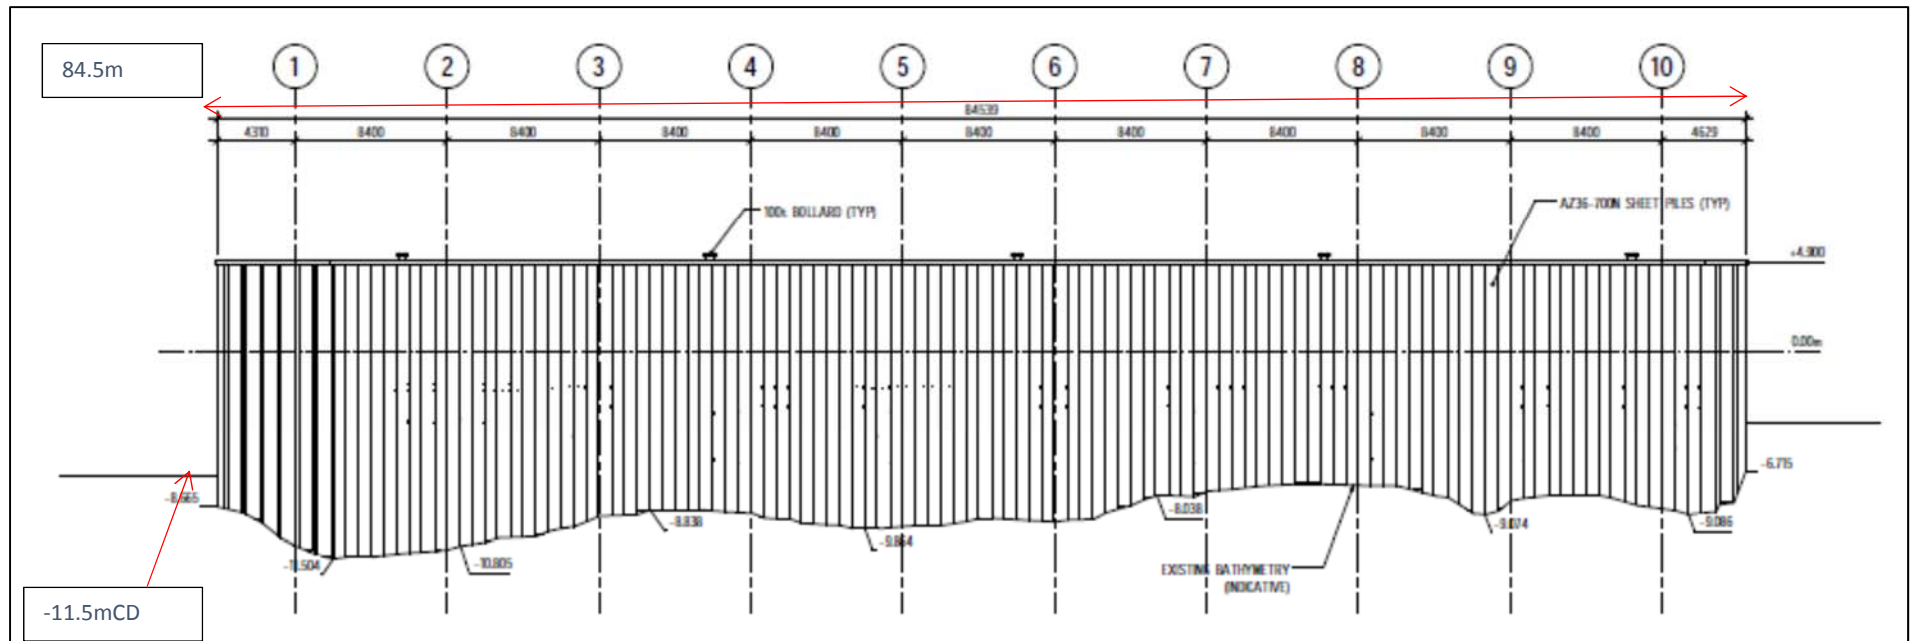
Rothera Wharf Preferred Layout - Elevation of front wall
